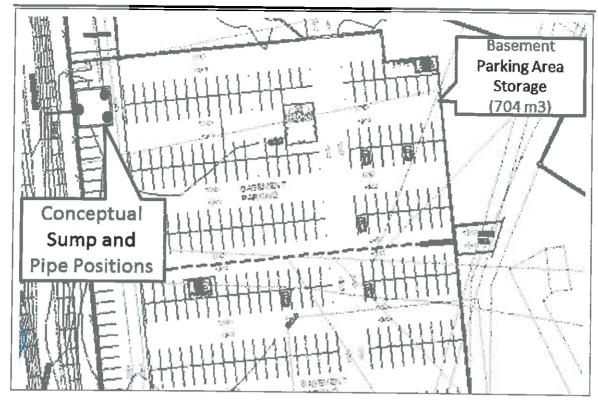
Conceptual Plan View of the Basement Level SWMP Infrastructure
